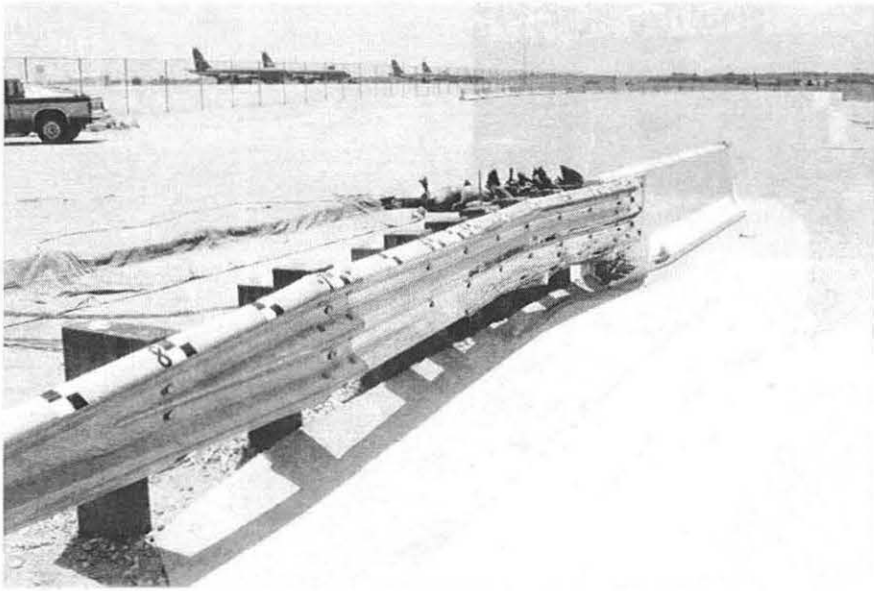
Barrier Damage, Test ITNJ-3 (Design No. 3)
